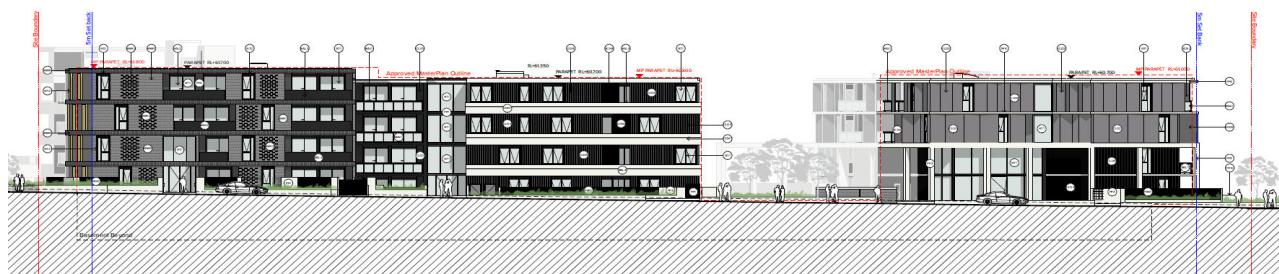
Extract from the South Elevation Plan showing the proposed residential flat building development, which is consistent with the maximum height and building envelopes approved in the Concept Plan (JRPP-15-02701 as amended), as indicated by the dashed red line.
